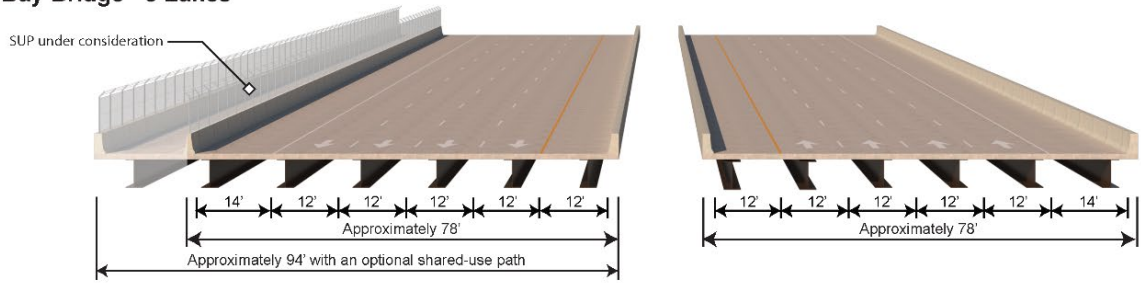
Alternatives D and E (8-8-8) Typical Sections for U.S. 50/301
